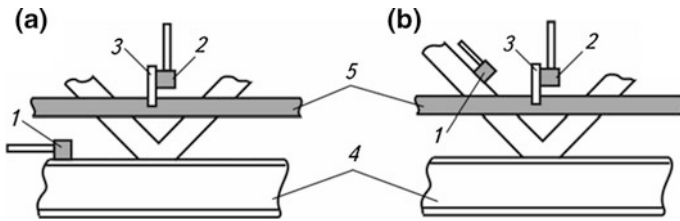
Location of the AET under the loading of span 0–1 (a) and spans 1–2 and 2–3 (b): 1 is AET No. 1; 2 is AET No. 2; 3 is a waveguide; 4 is a lower girder boom; 5 is a reinforced concrete plate of the bridge roadway
